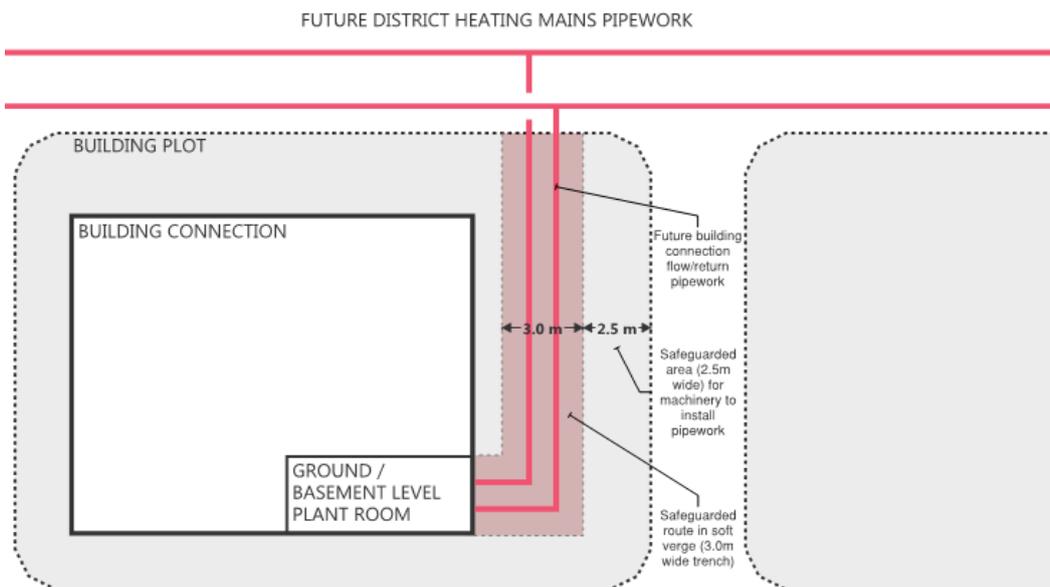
3 Plan of safeguarded route from plant room in building to district heat main
